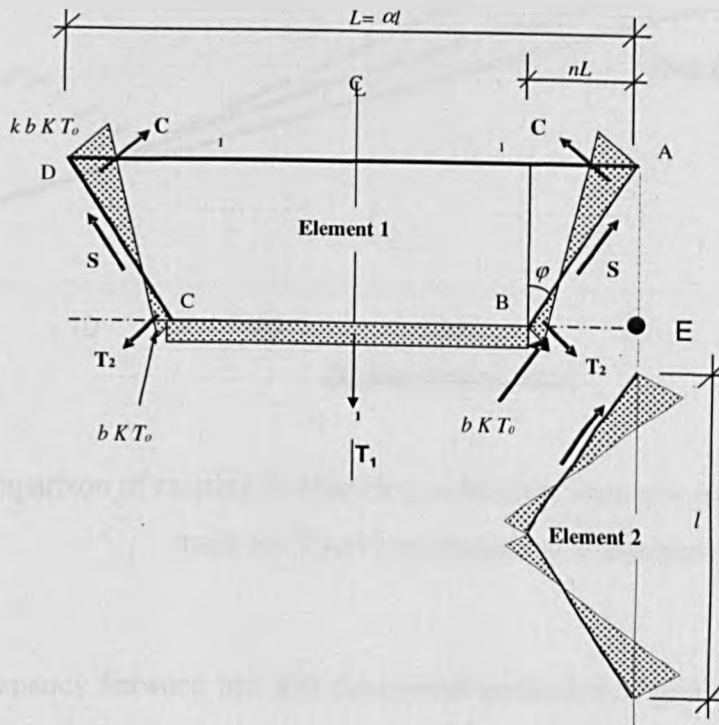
Modified failure mode for orthotropic slabs with less reinforcement across the shorter span.
